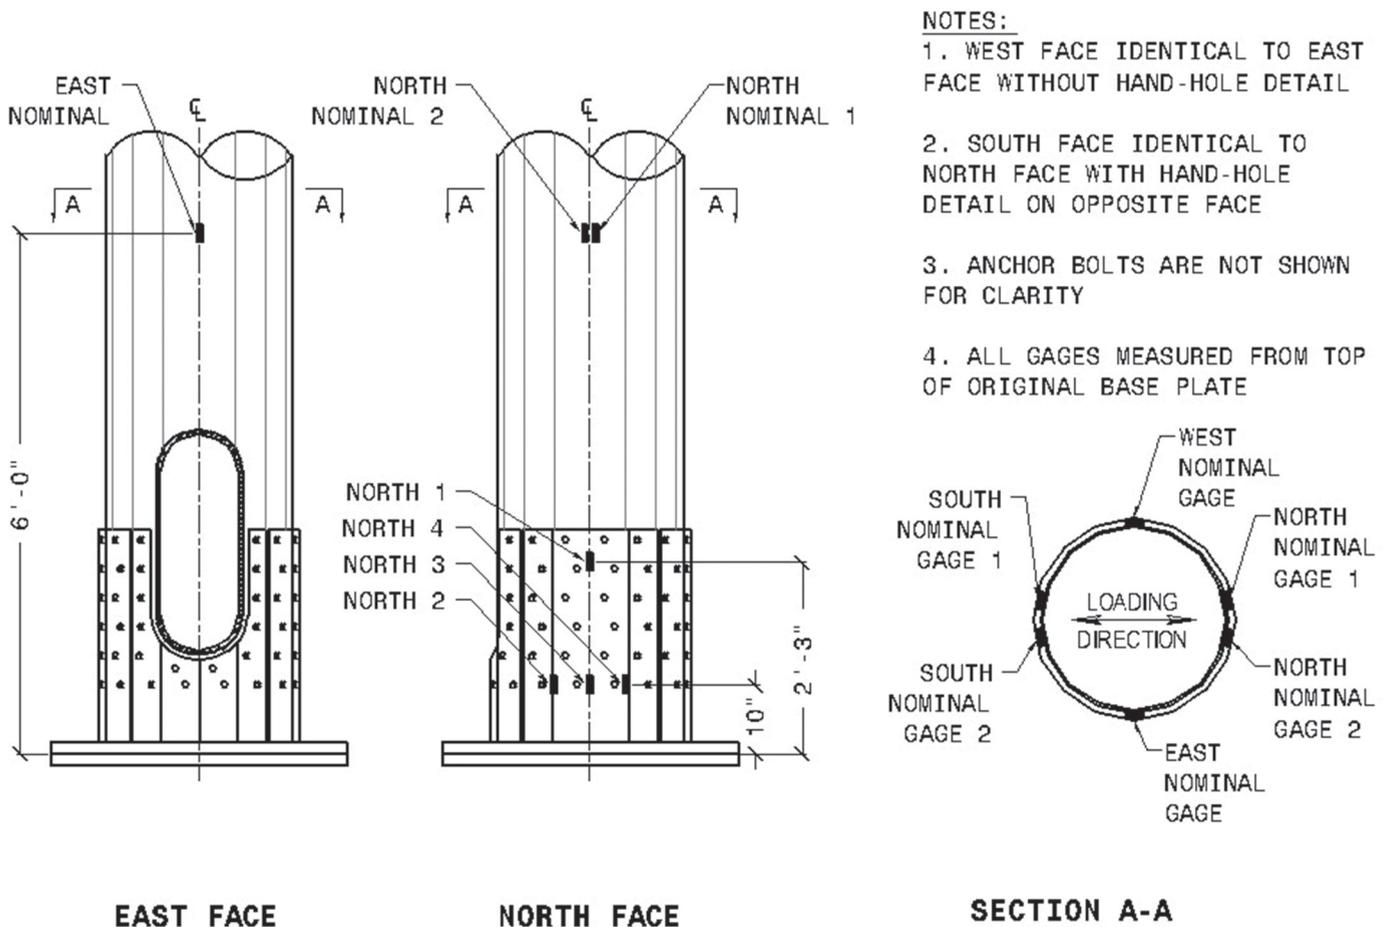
Dimensions and strain gage layout of short-jacket specimen.
